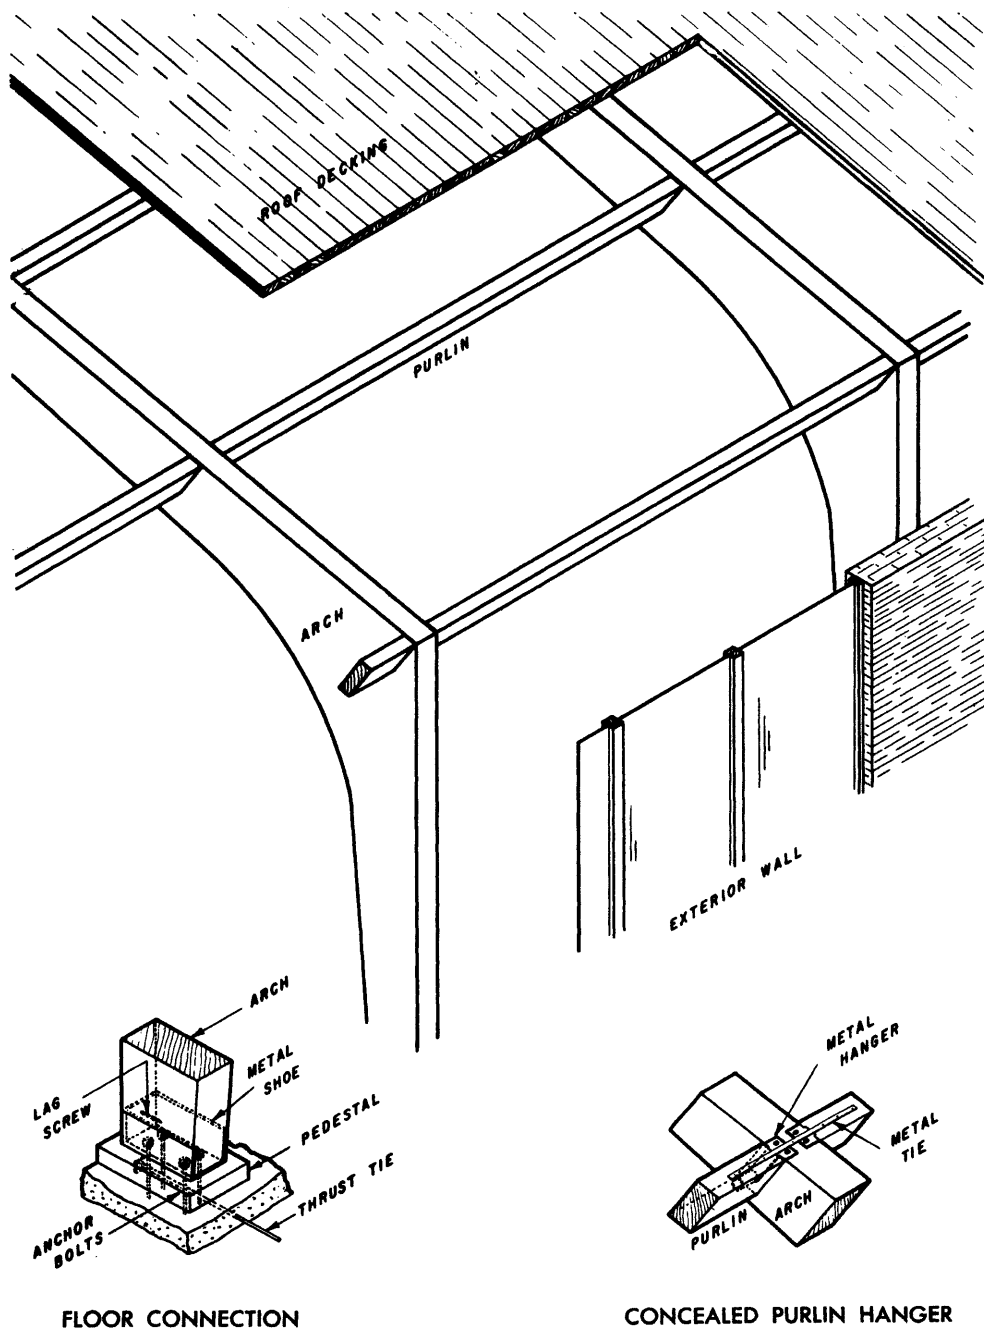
Rigid arch frame supported at floor. (Courtesy of American Forest and Paper Association)
